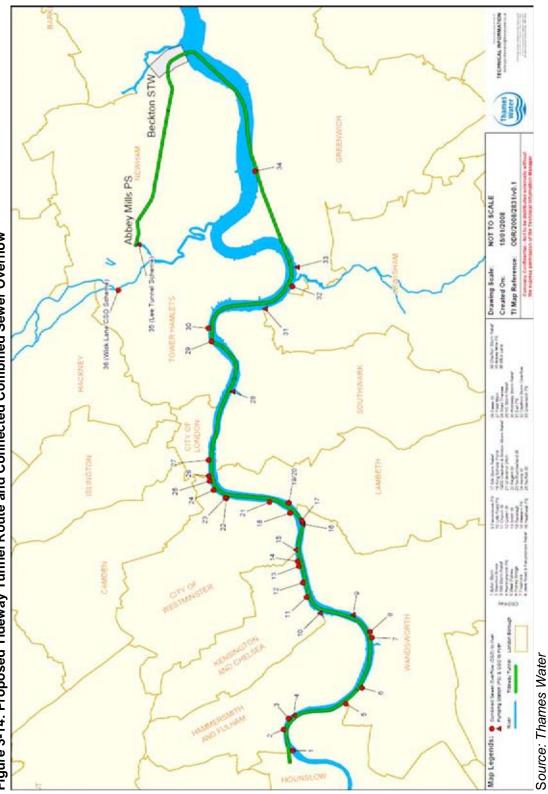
Proposed Tideway Tunnel Route and Connected Combined Sewer Overflow
